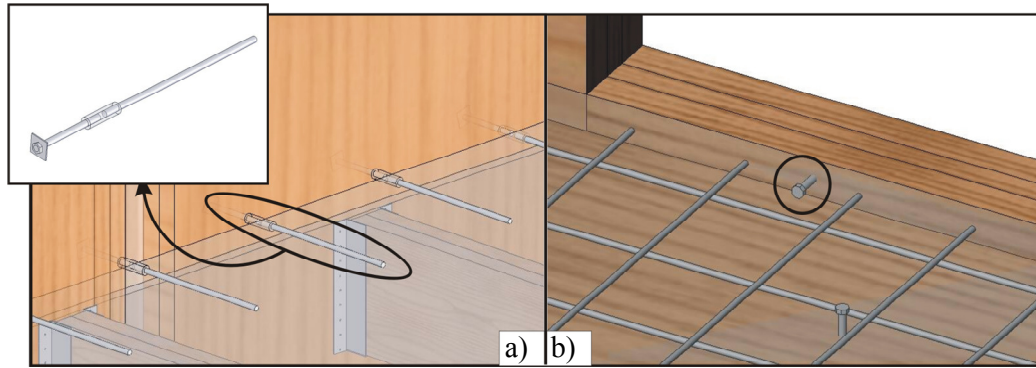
a) Wall to floor and b) frame to floor shear connection (Smith 2008)
